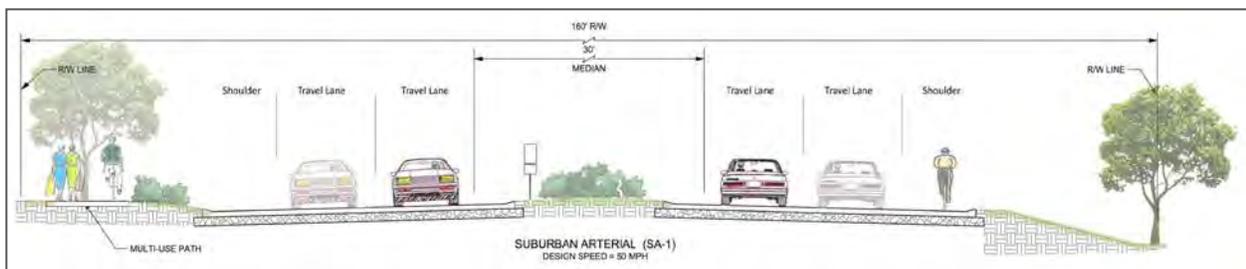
SA-1 (Good Pine Couplet) Typical Section
